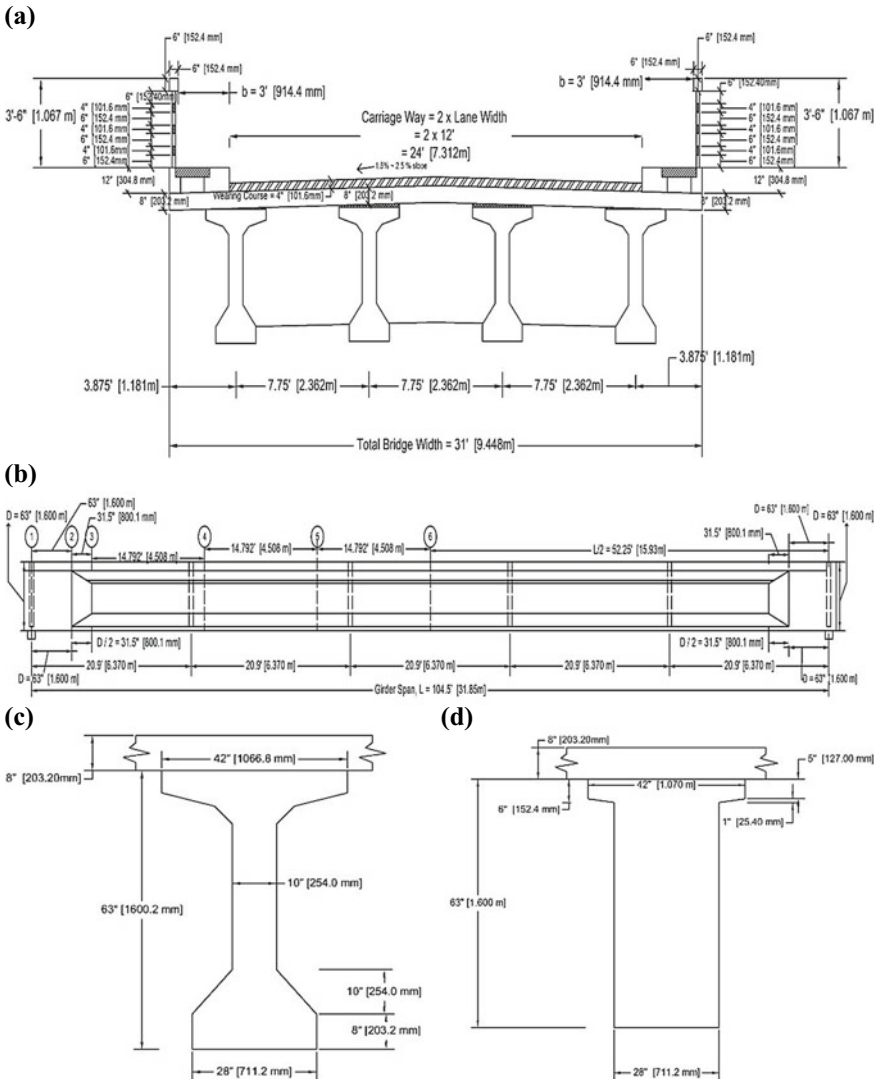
a Deck configuration of model bridge; b Longitudinal section of AASHTO Type V girder, c Cross section of Mid-section and d Cross section of End-section
